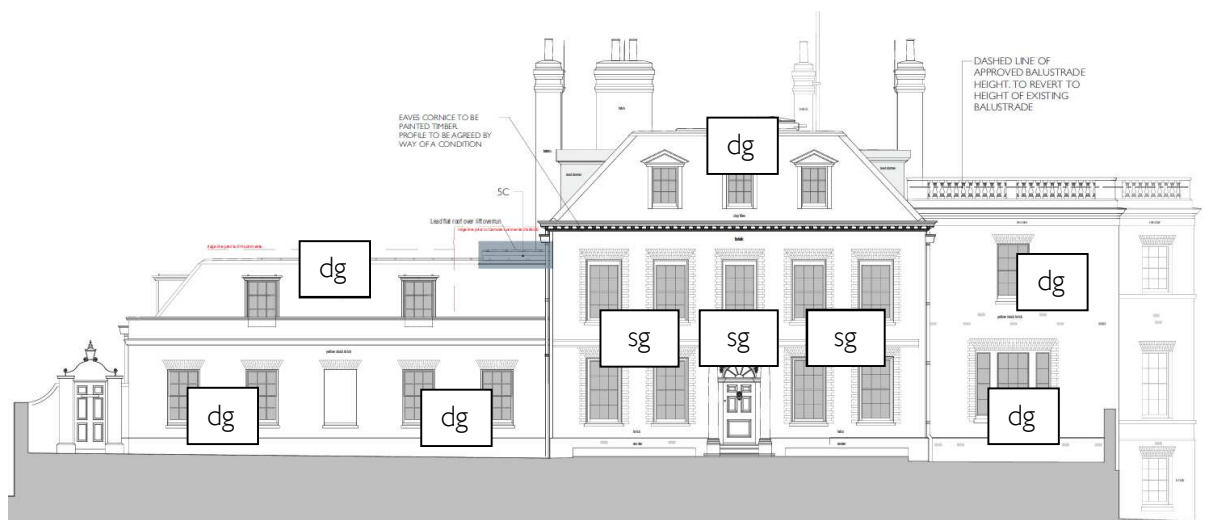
Extract of Approved Proposed South Elevation HH-1017-AP-01L
